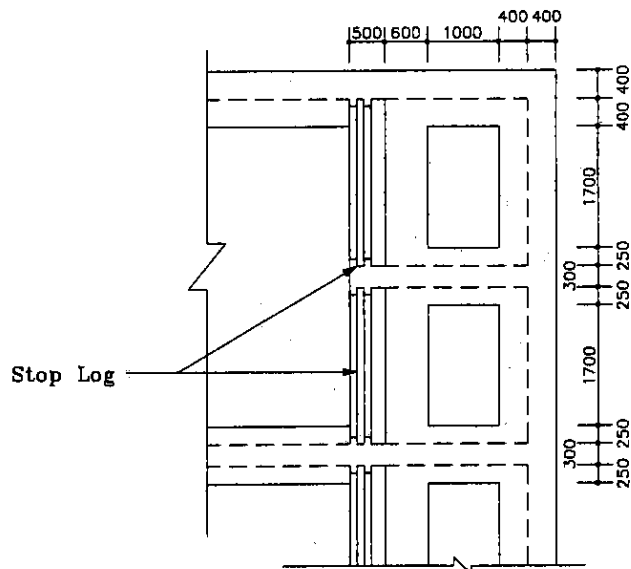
PROPOSED INTAKE PUMP
